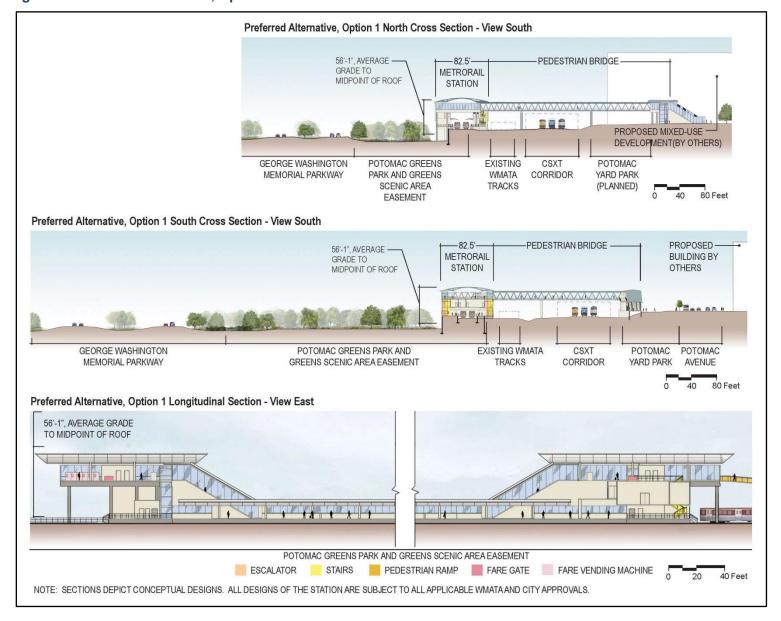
Preferred Alternative, Option 1 Eastern Elevation View
